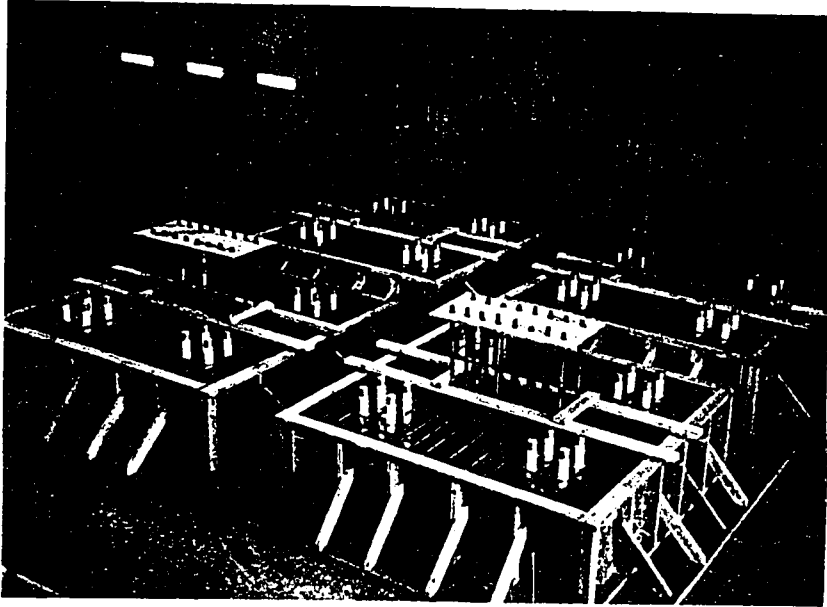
Four footings prior to casting of concrete. Front footings are for flexural columns.
